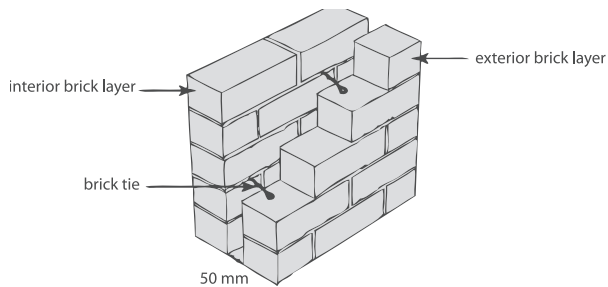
Cutaway view of a cavity double brick masonry wall shows the internal and external brick layers and the metal ties that attach the two. (Source: AIR)
